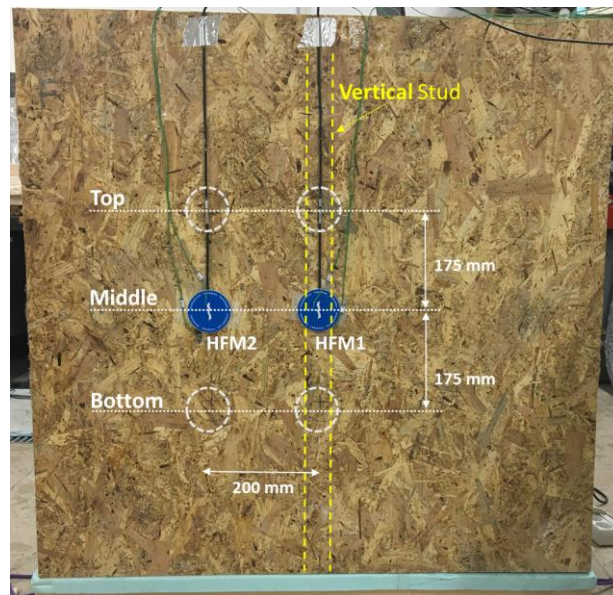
Sensors locations on exterior wall surface (HFM – Heat Flux Meter; TC - Thermocouples) of the specimen wall.
